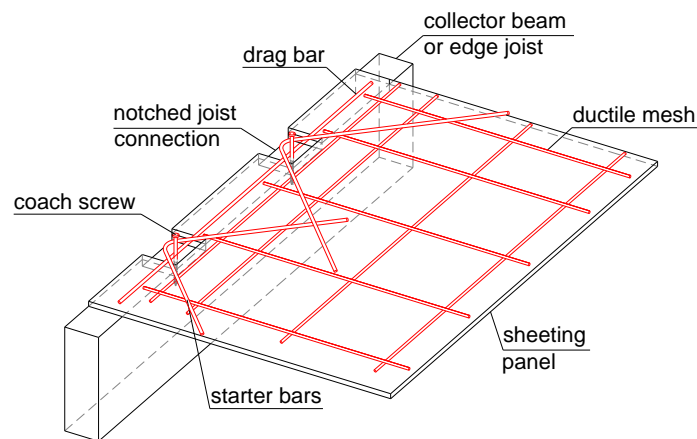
Suggested connection between the concrete topping and the timber beam
